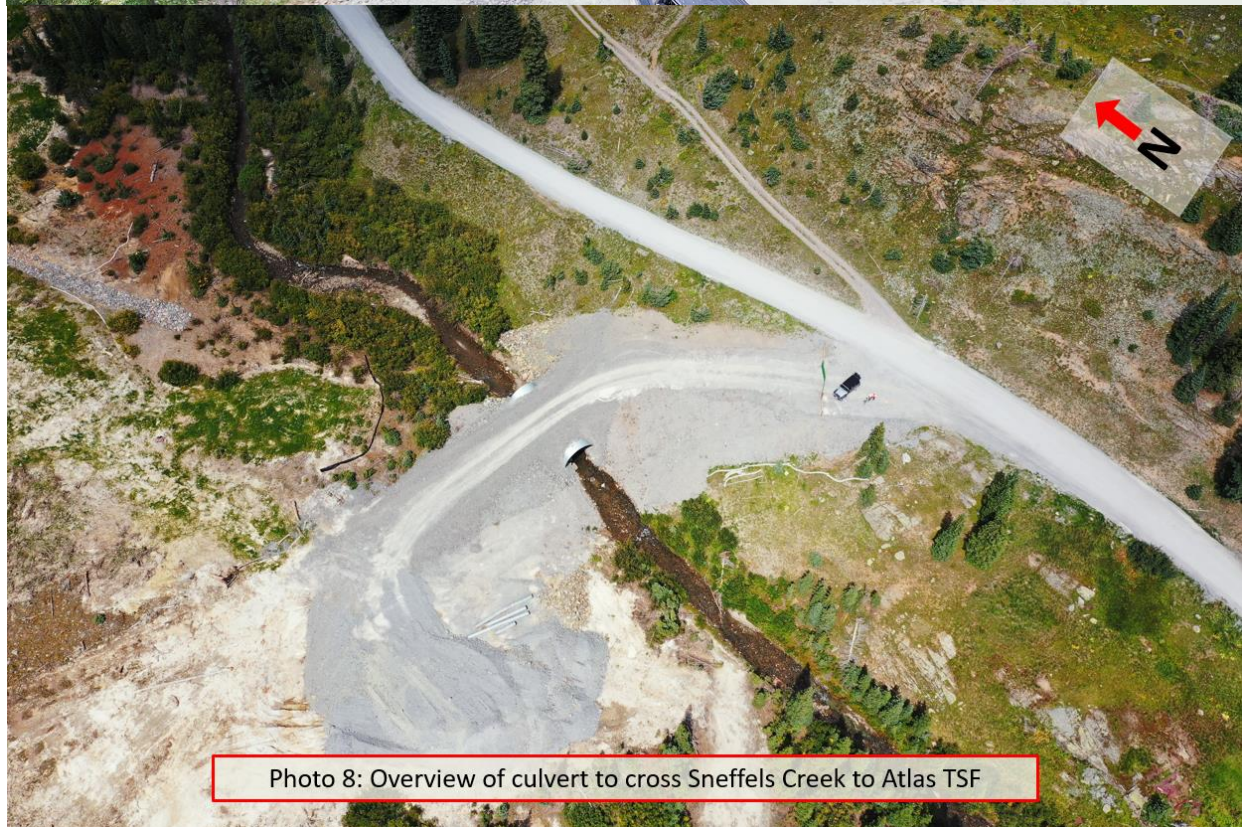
Overview of culvert to cross Sneffels Creek to Atlas TSF
